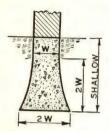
Wide Bottom of Foundation Serving as Footing in Firm Ground
